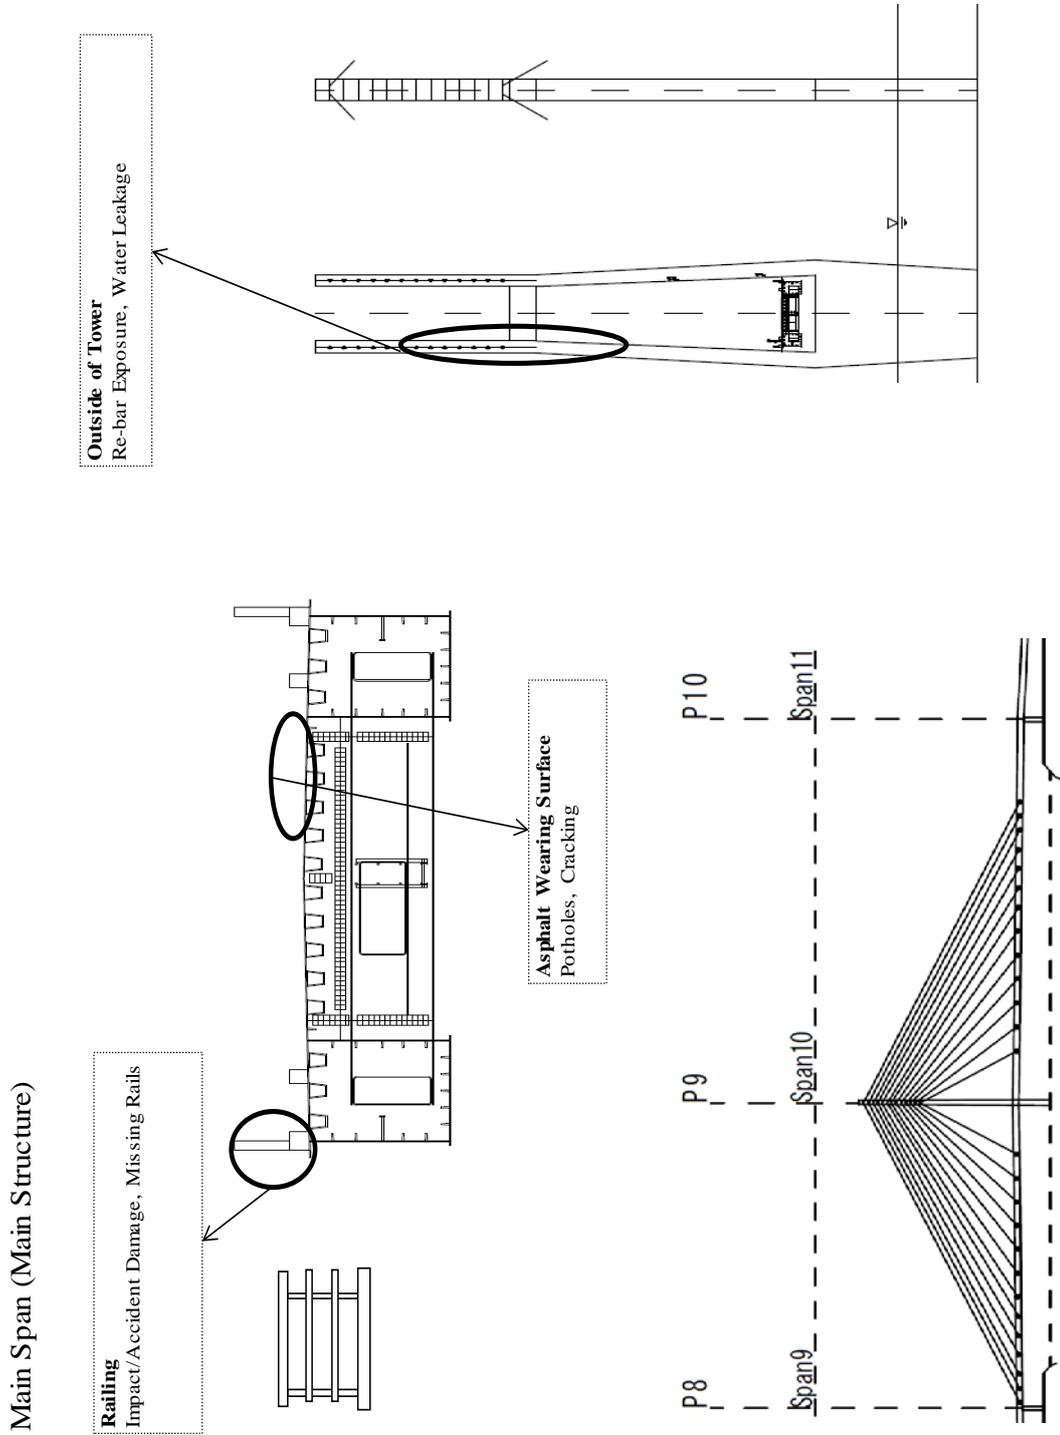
Routine Inspection Route of Diosdado Macapagal Bridge
